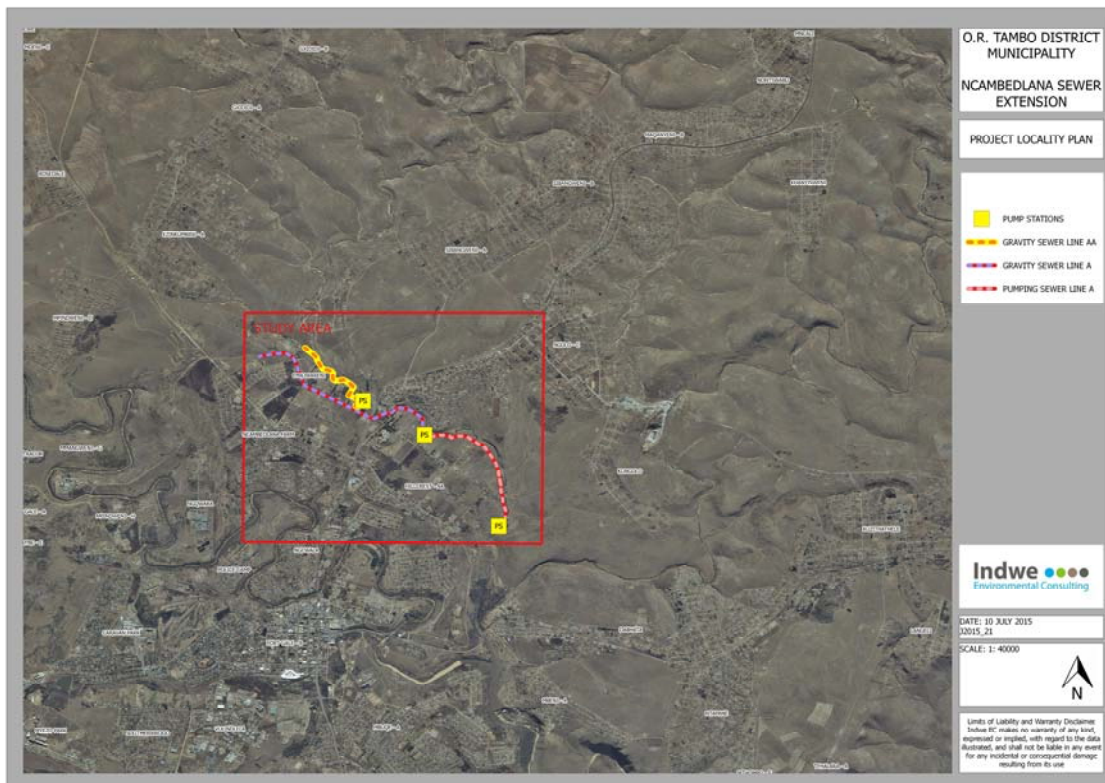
Aerial Plan illustrating the location of the proposed new Ncambelana Sewer Extension project.
